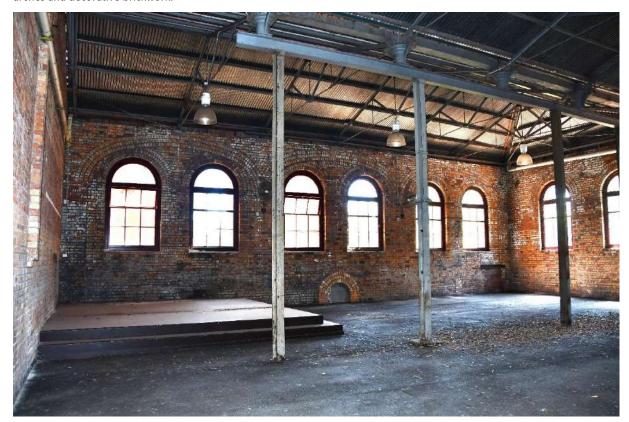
General interior view of the Boiler Room (Item B) showing the western wall with relieving arch.
